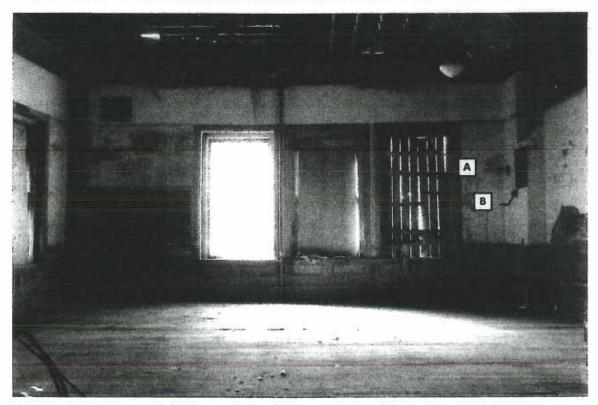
Room 17 view west. (A) Flue opening in wall for non-extant wood burning stove, (B) Heating Vent.
